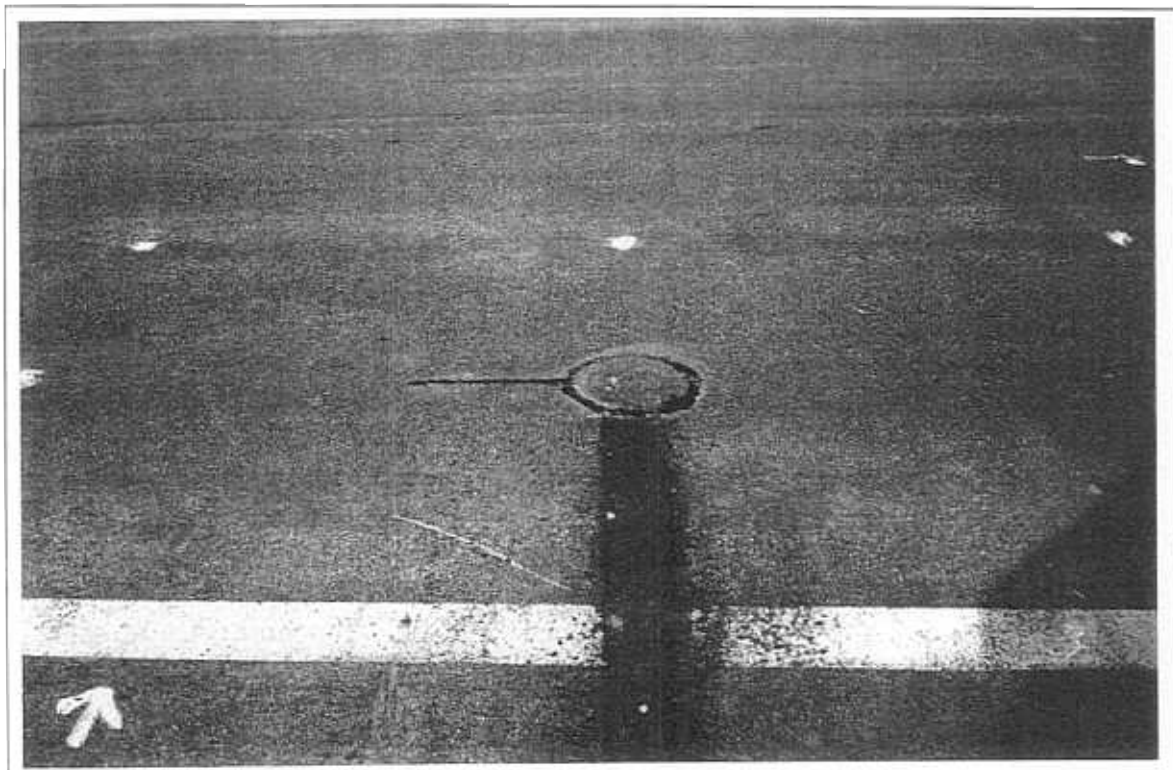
Instrument Hole and Trench Area Two Months After Installation
